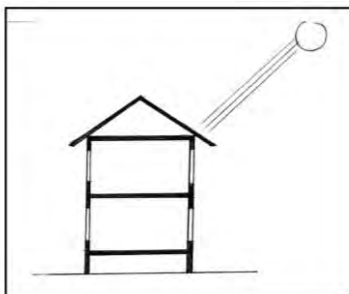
Overhang and Shedding: Section Shows Elongated roof prevent direct sun.
